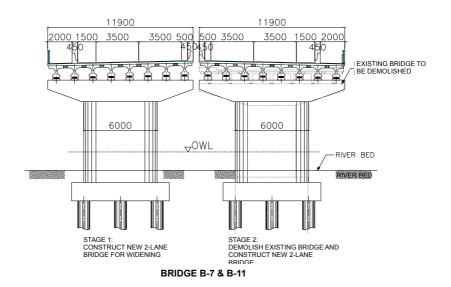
REPLACEMENT OF EXISTING BRIDGE AND 2-LANE WIDENING WITH MULTI-SPAN BRIDGE
